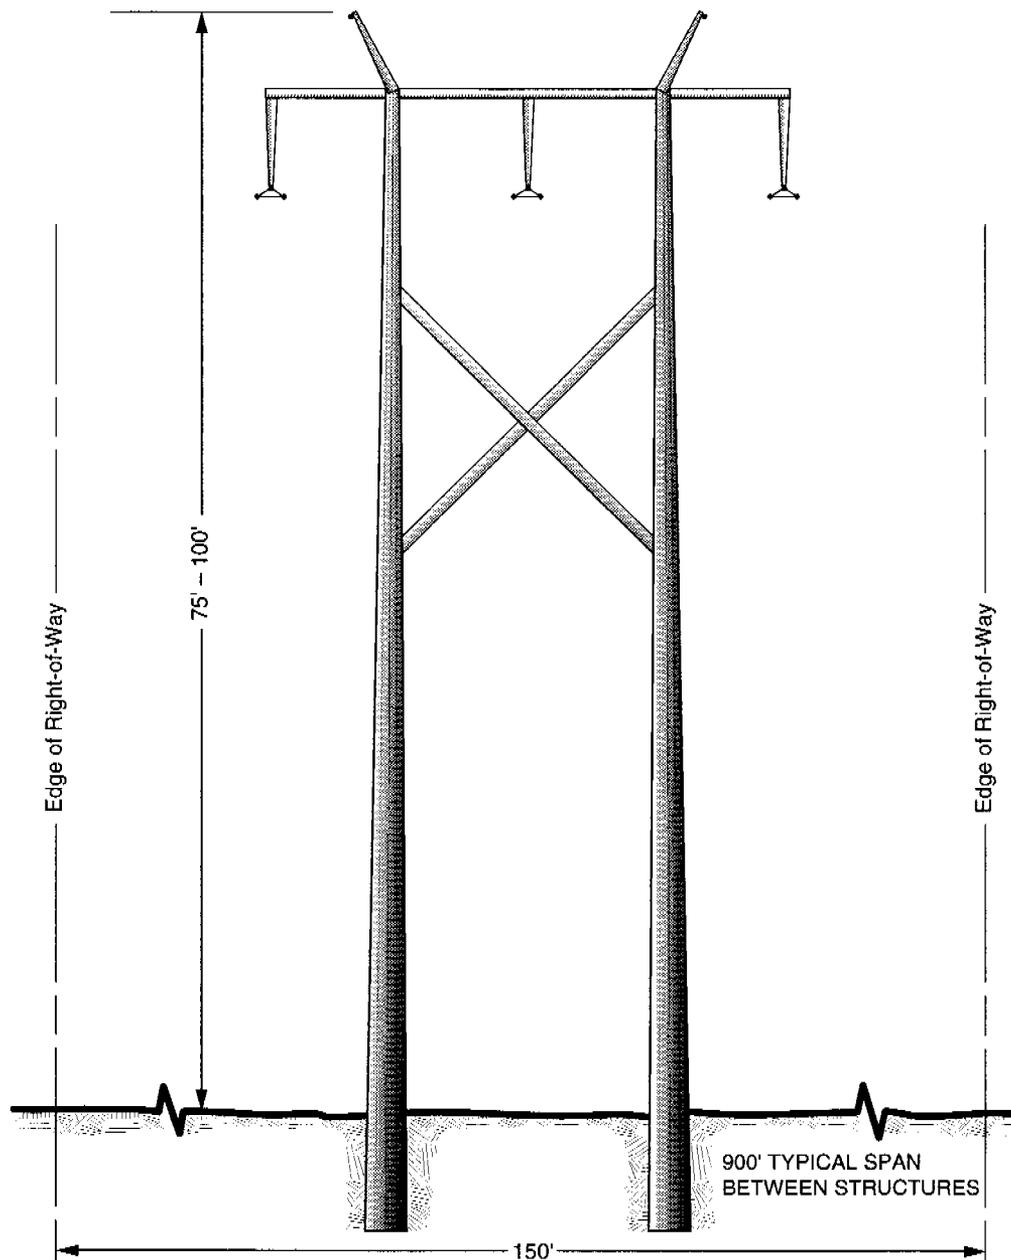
EXHIBIT G – CONCEPTS OF TYPICAL FACILITIES
